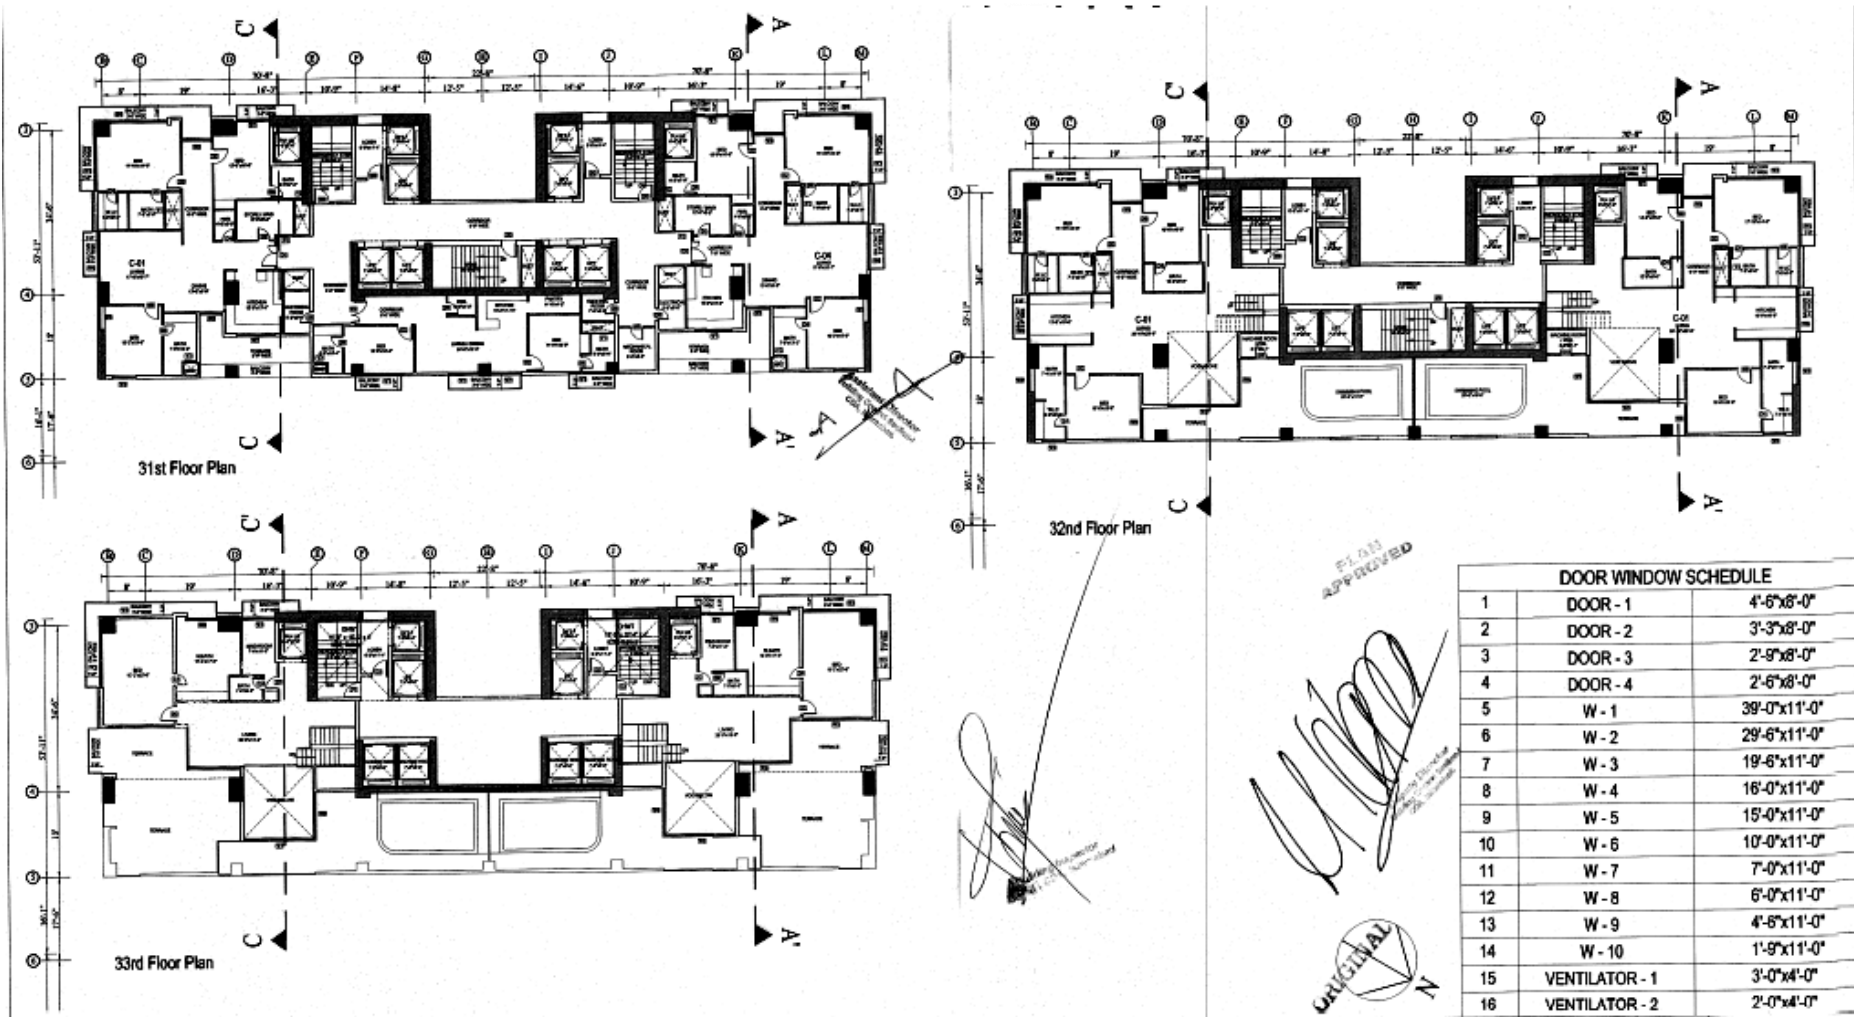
Layout plan of 31st – 33rd Floor Tower C of The Garden Residence Project, Sector F-10 Markaz, Islamabad
